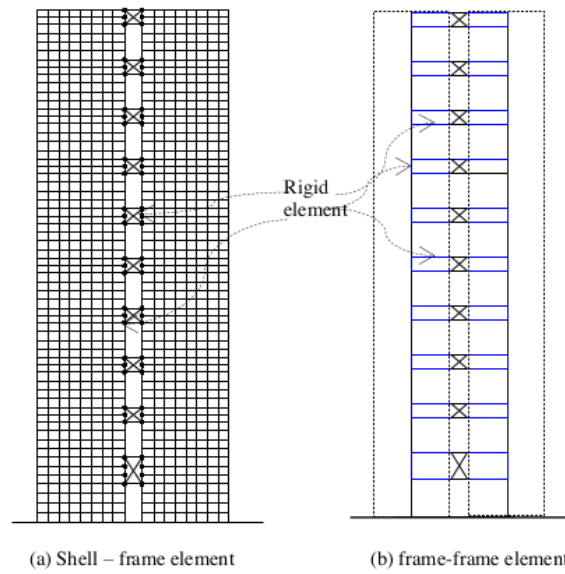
Modelling Steel truss coupling beam in coupled shearwall
